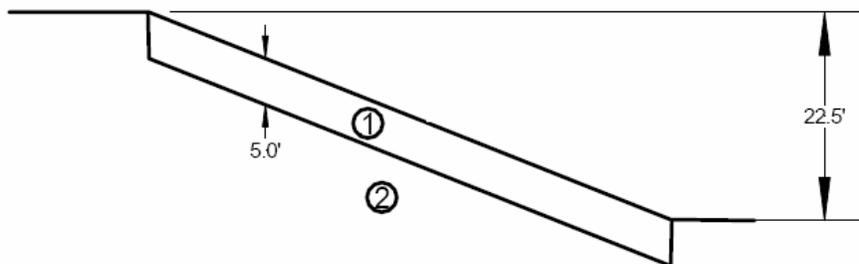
Slope section assumed in stability condition B (after Loehr and Bowders, 2007).
